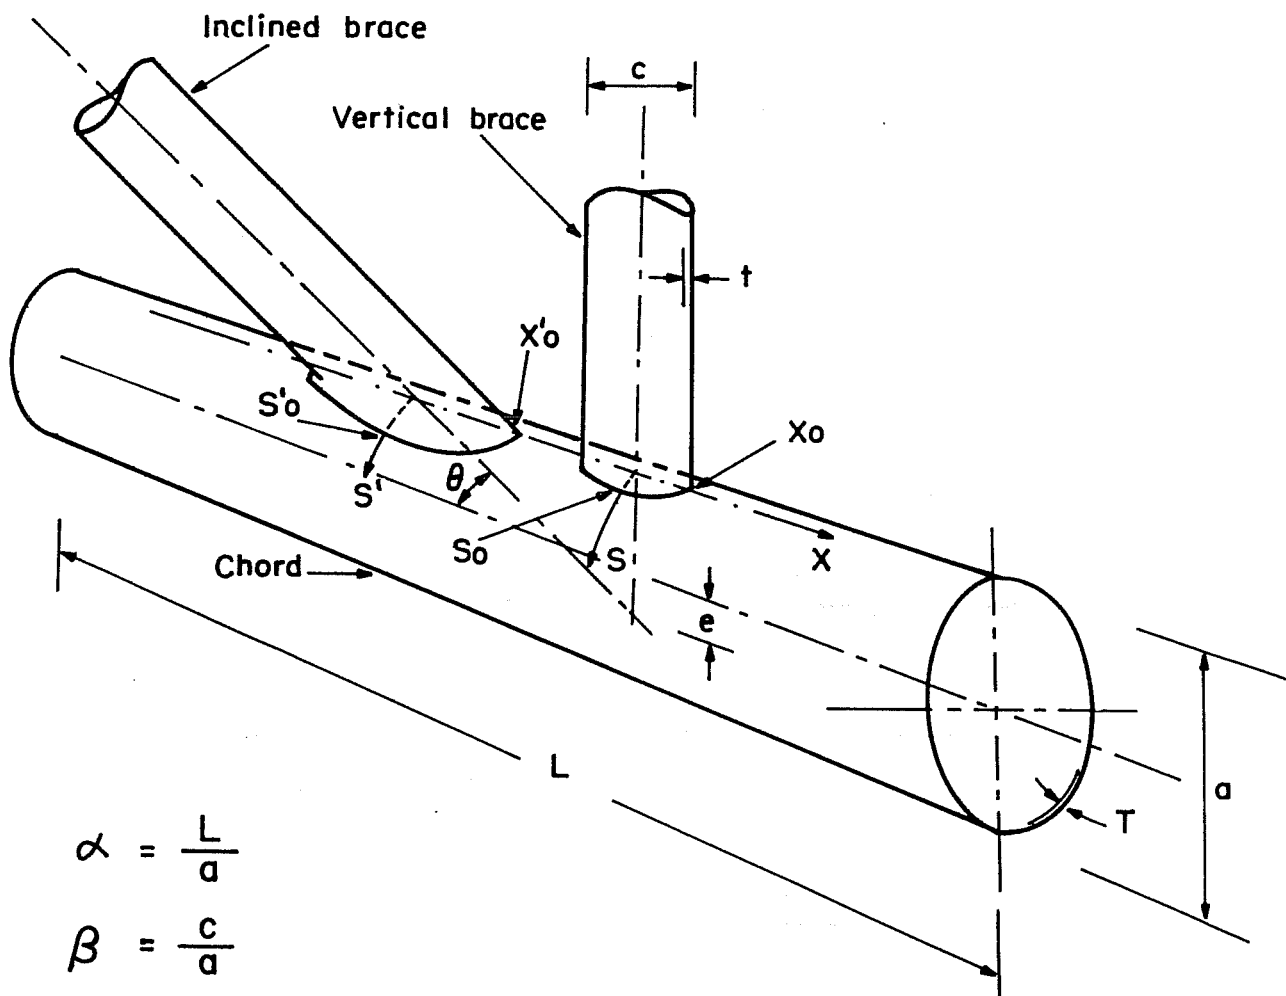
K-JOINT SPECIMEN TESTED IN JAPAN (II).
